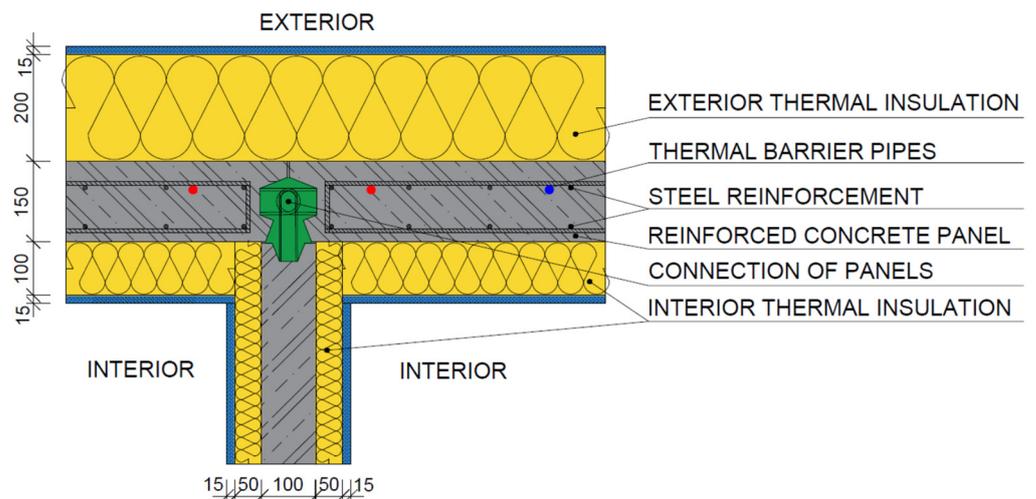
“Detail C”, a through joint of two perimeter panels with an internal load-bearing panel. The colored points (red and blue) in the picture are thermal barrier pipes.
